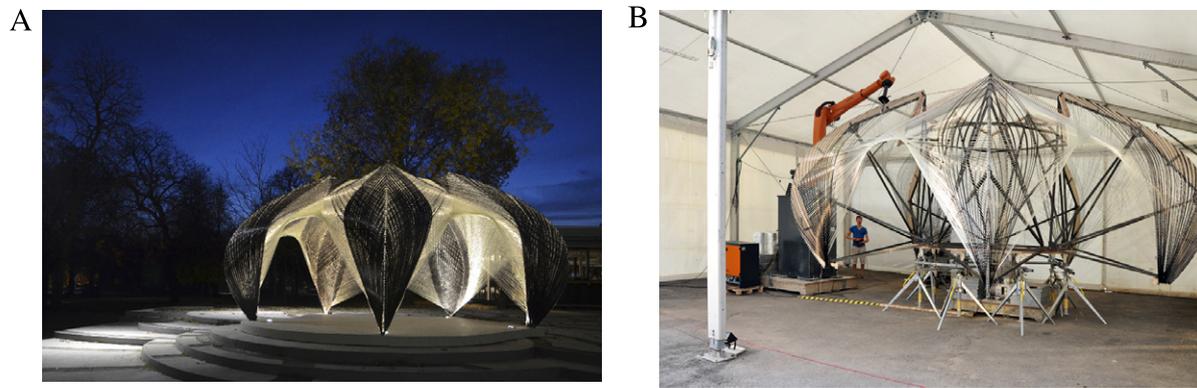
Full-scale prototype. (A) View of finished pavilion. (B) View of robotic winding process.
